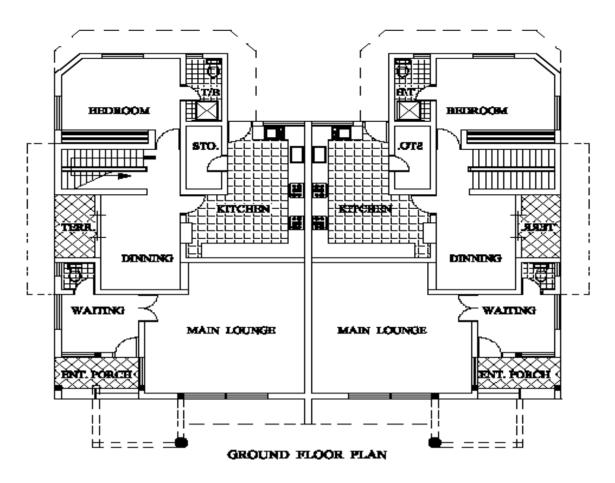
Ground Floor Plan of a Typical Semi-Detached Building
